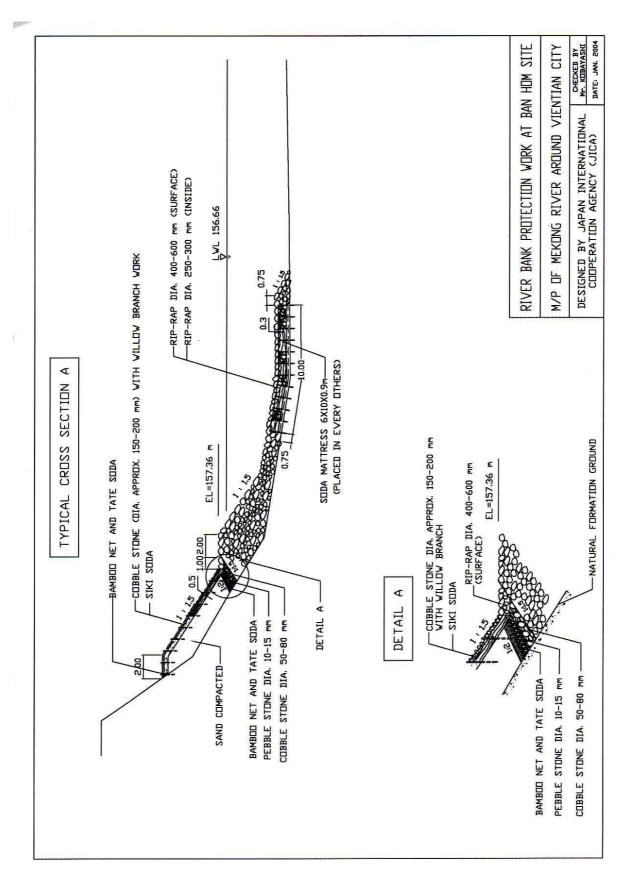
(1/2) Typical Cross Section of Riverbank Protection Work (Type A) at Ban Hom Site
